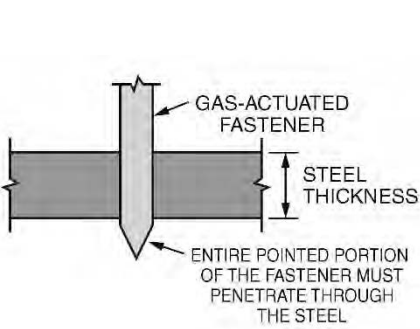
FASTENER PENETRATION THROUGH STEEL WHERE REQUIRED
